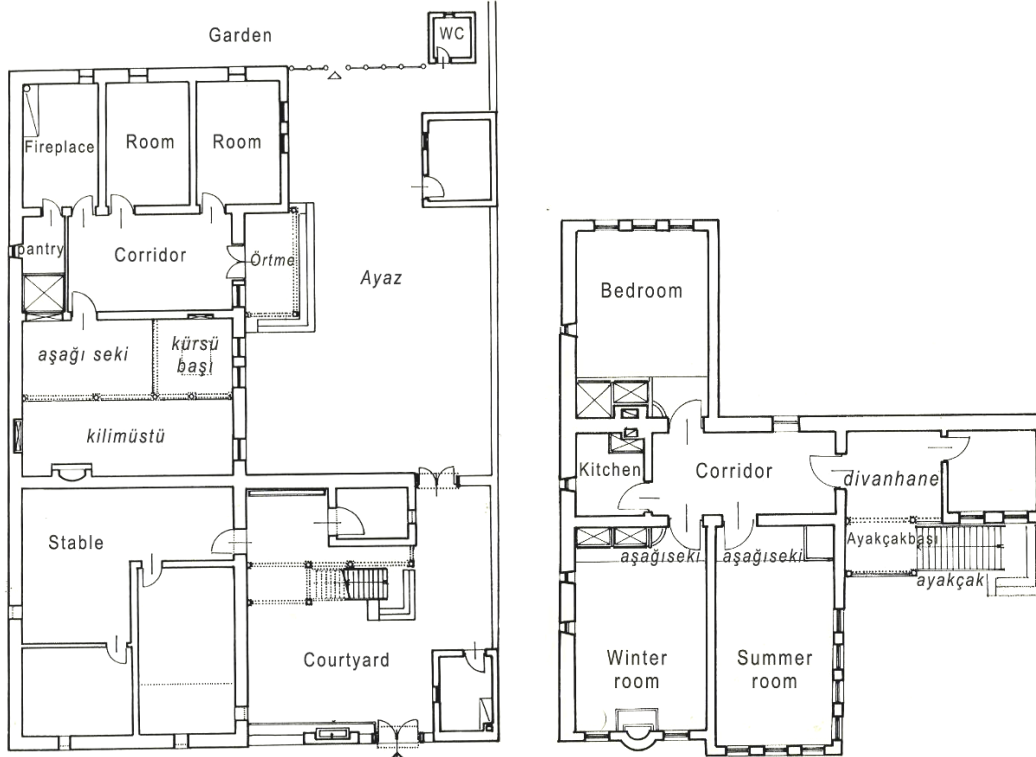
Hafislioğlu Ebubekir Efendi House-ground floor plan, first floor plan (Sakaoğlu, 1978)
